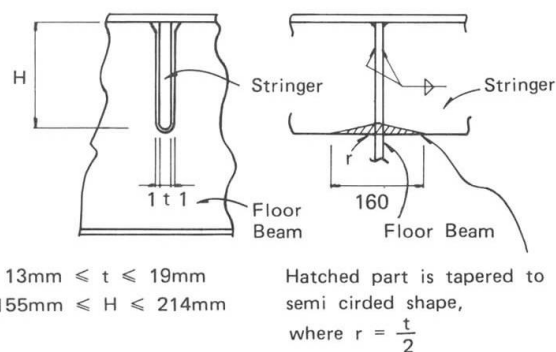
Details of Slit Where Stringer and Floor Beam Meet
